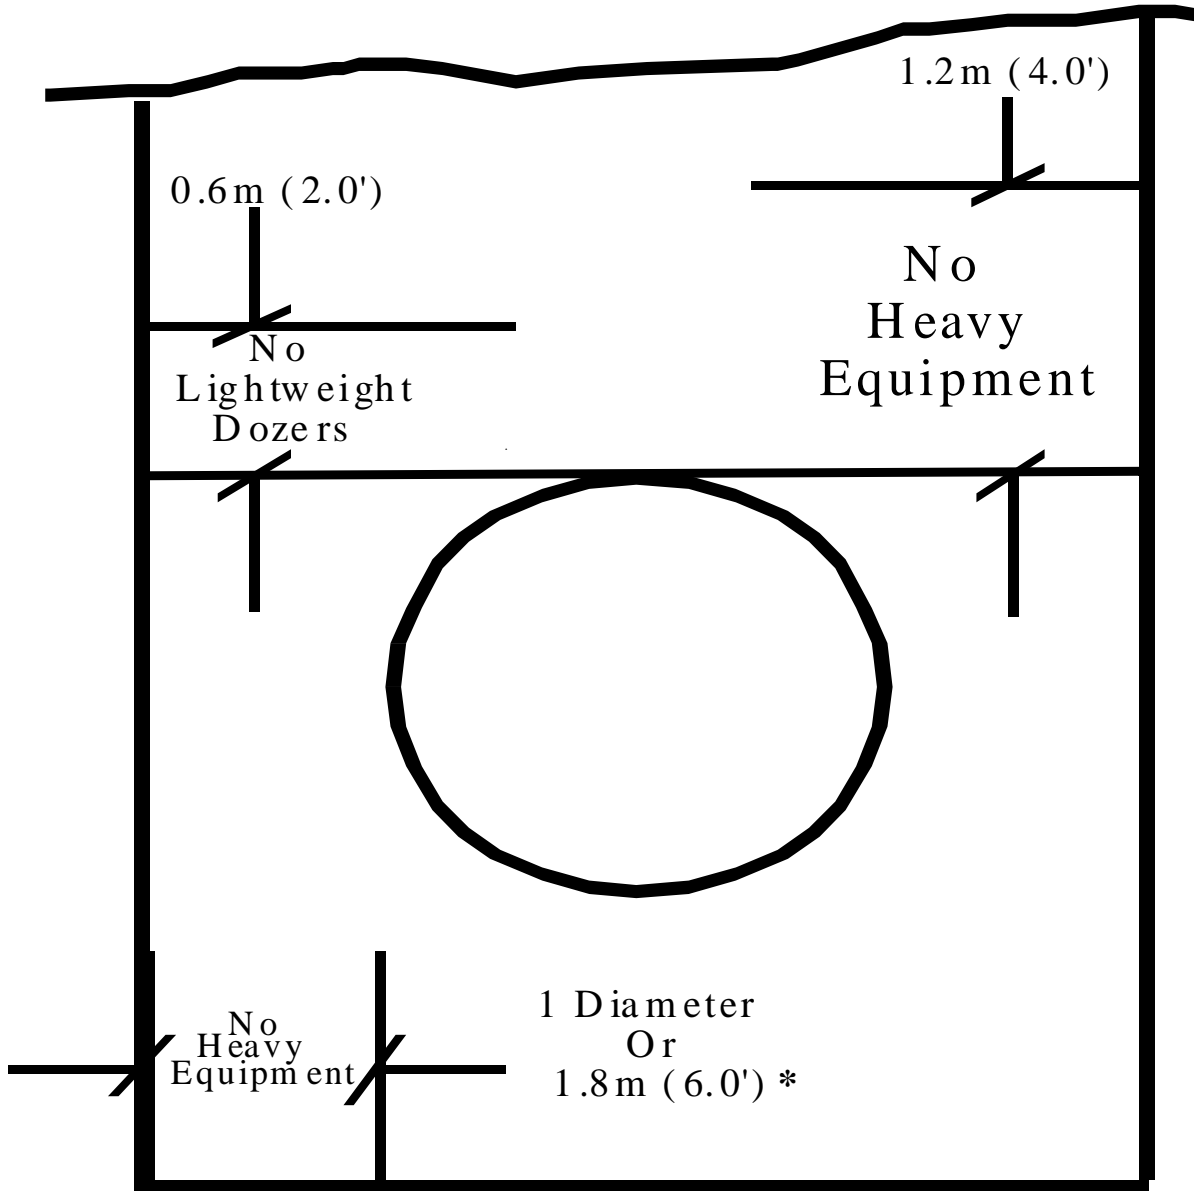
Backfill for Large Conduit Structure in a Fill
